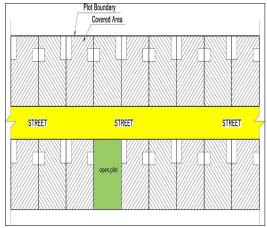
Layout of street houses at Thanda Choa Road, Abbottabad
